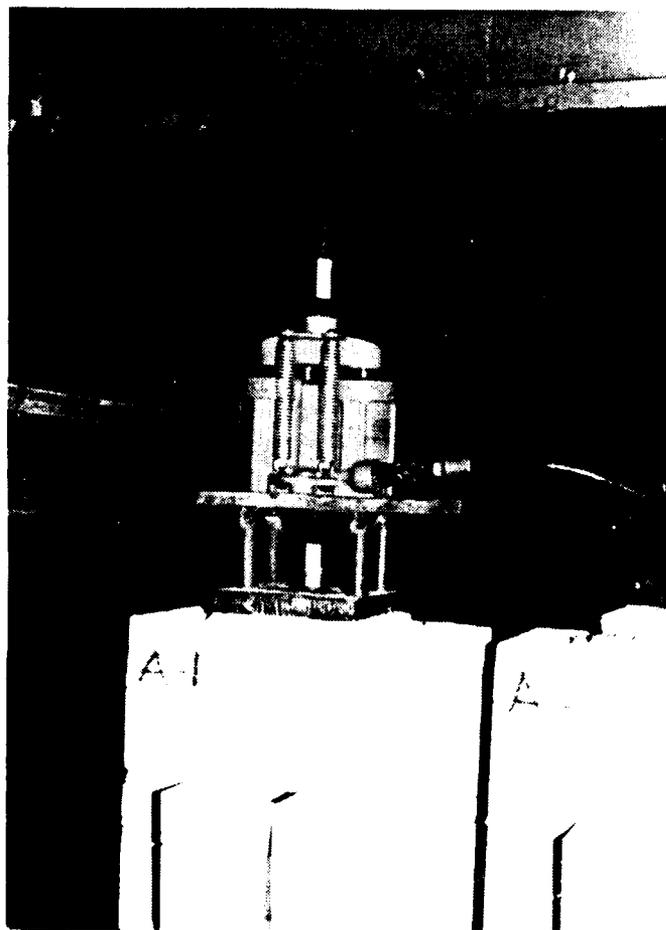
Hydraulic Jack and Jacking Table on Wall Panel.
